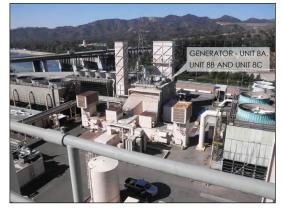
Overview of Project Area from Roof of Grayson Boiler Building Looking Southwest
